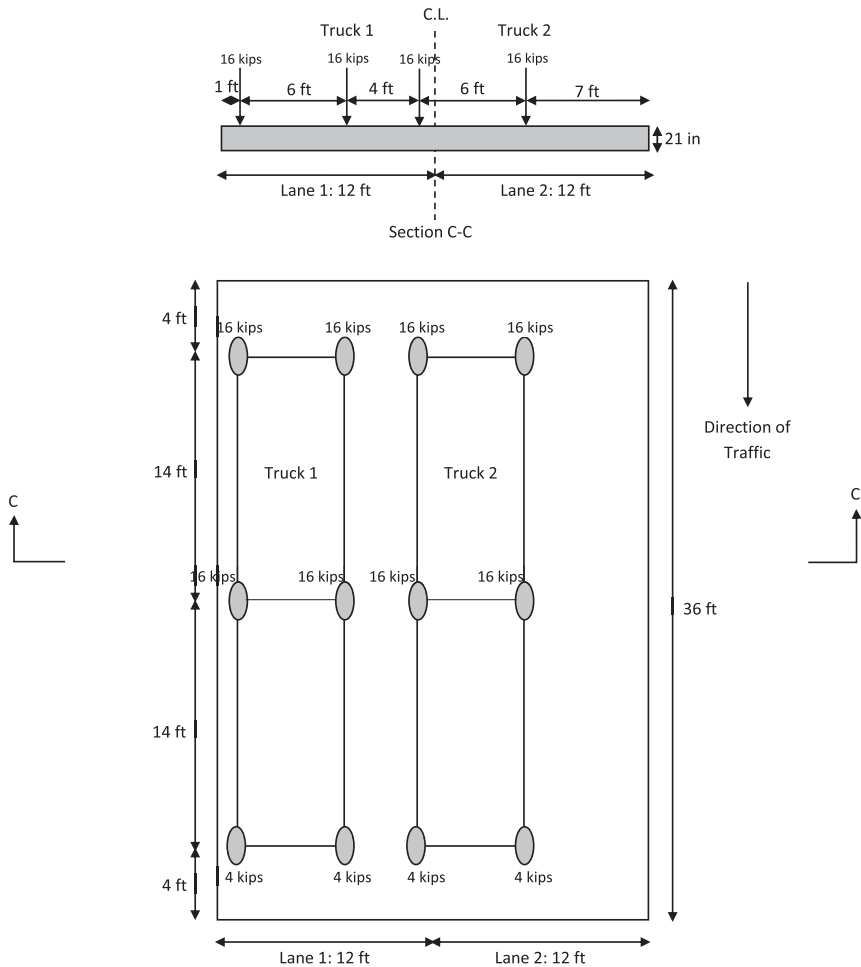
Typical cross-section and plan of a 36 ft span, two-lane bridge under Edge Loading condition.
